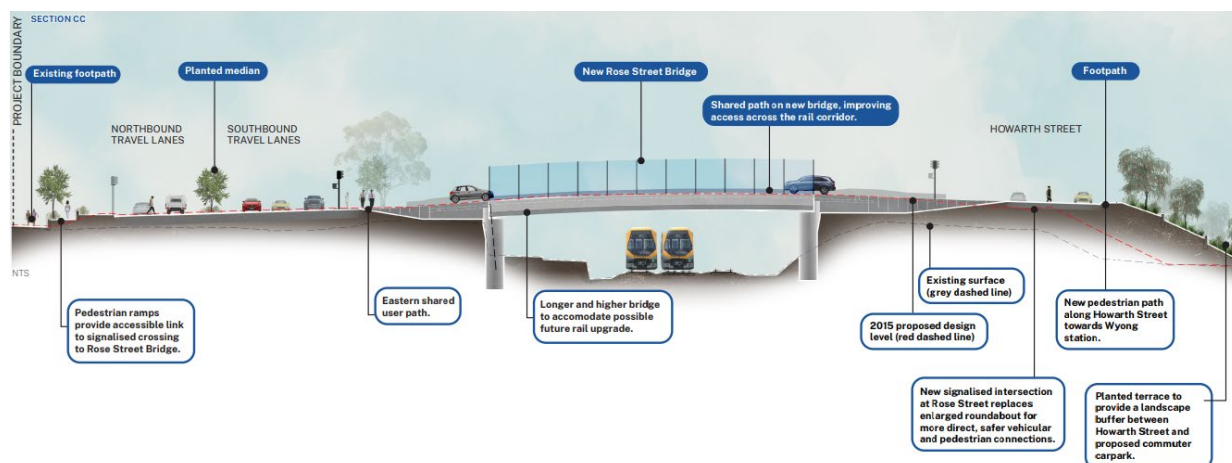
Howarth Street and Rose Street bridge cross-section
